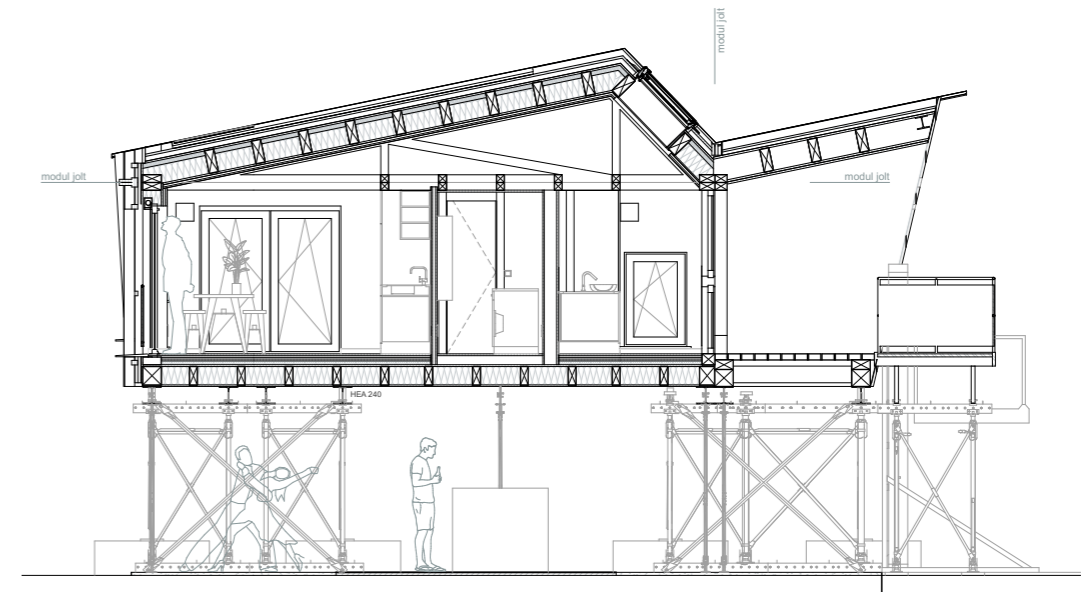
30. The section of the HDU showing the scaffolding, living space, core and roof structure with the PVT panels
